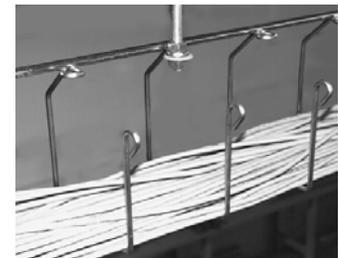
Suspending Snake Tray from threaded rod using the "Snake Eyes"
